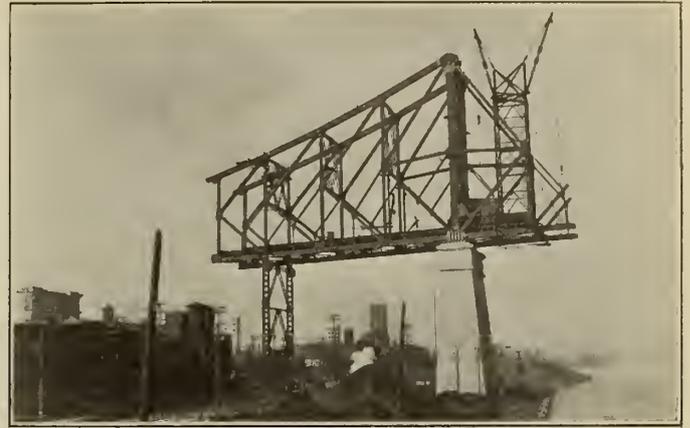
Main Span, North Side—Erection proceeding on Cantilever Arm. Progress as at March 16th, 1928.
